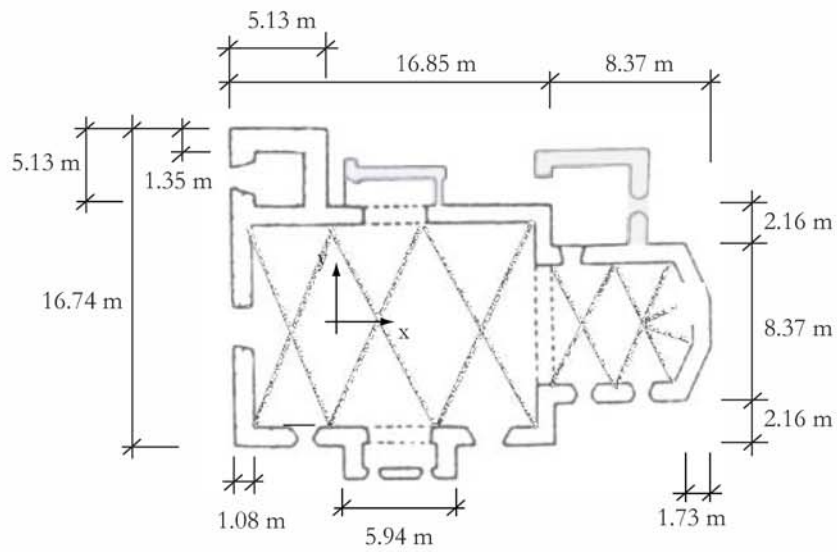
Plan of Santo Stefano di Valeriano, with dimensions (the plan is taken from [Do 94]).
